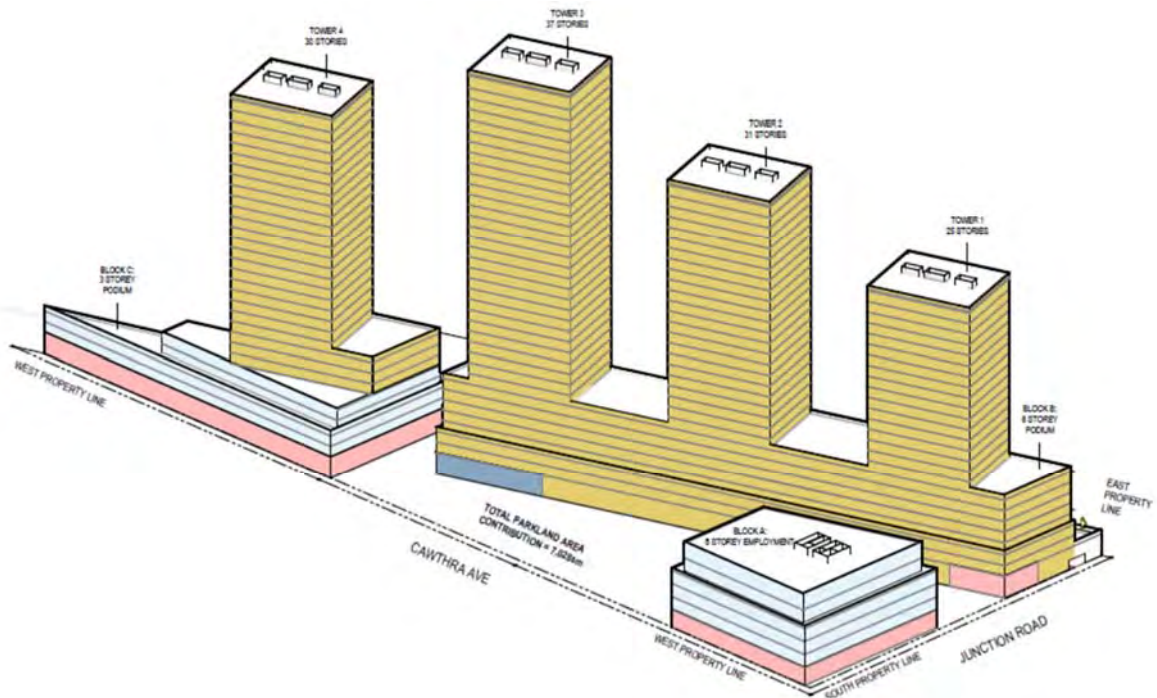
Conceptual Massing of the Site Plan for the proposed Mixed Use Community
